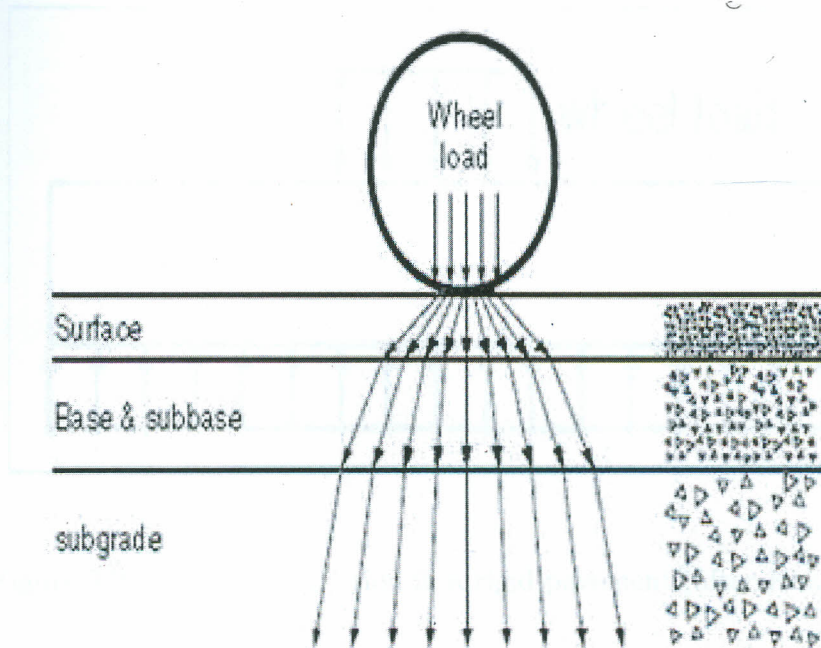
Load distribution in a flexible pavement (after Fwa[11])
